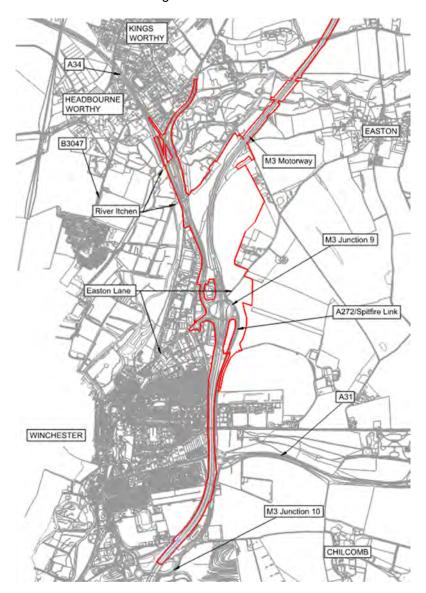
M3J9 Improvements Scheme Location Plan
